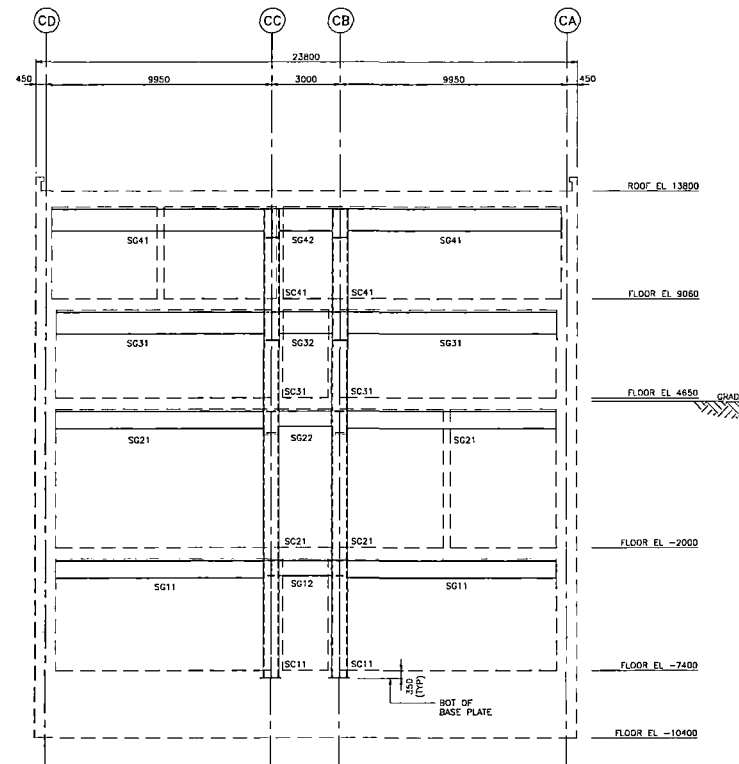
Structural Steel Member, Elevation on Col-Row C2
